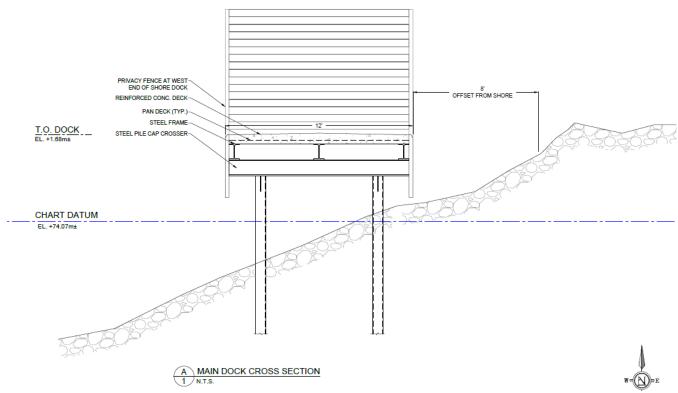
Dock Sectional Elevation (Source: Kehoe Marine Construction Ltd.)
